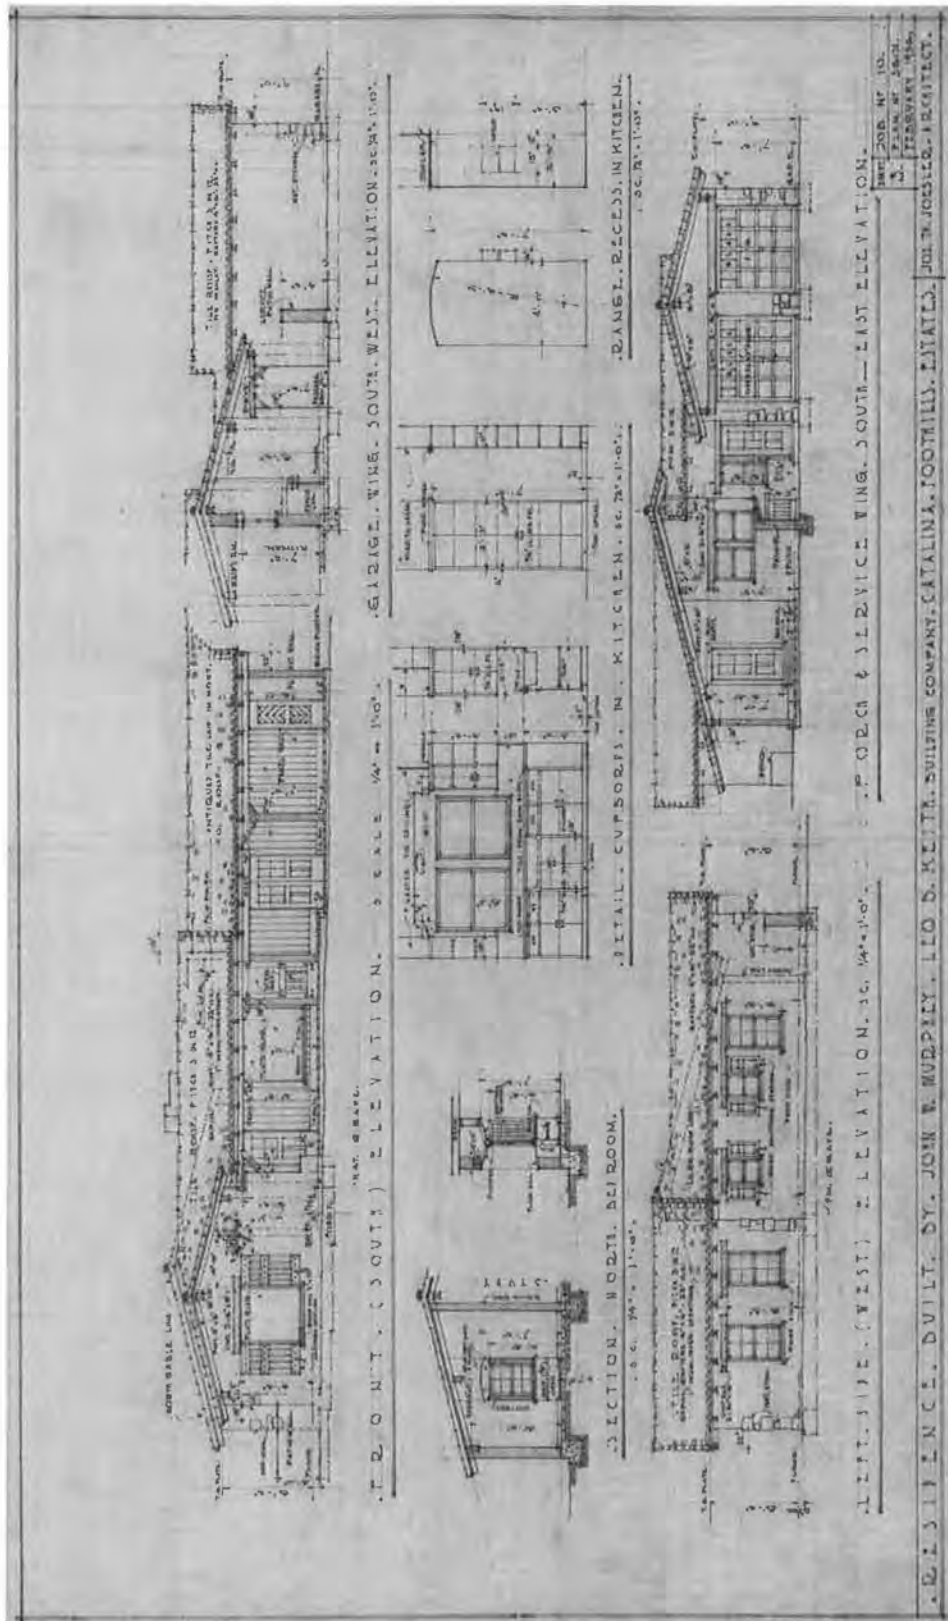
Joesler Elevation Plan (Craig House) 1936 South, East and West elevations, Arizona Architectural Archive
